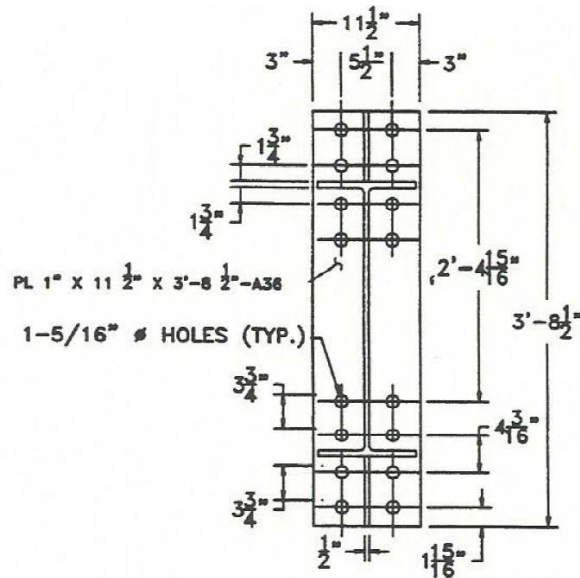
End-Plate Layout for Specimen 8ES-1.25-1-30
